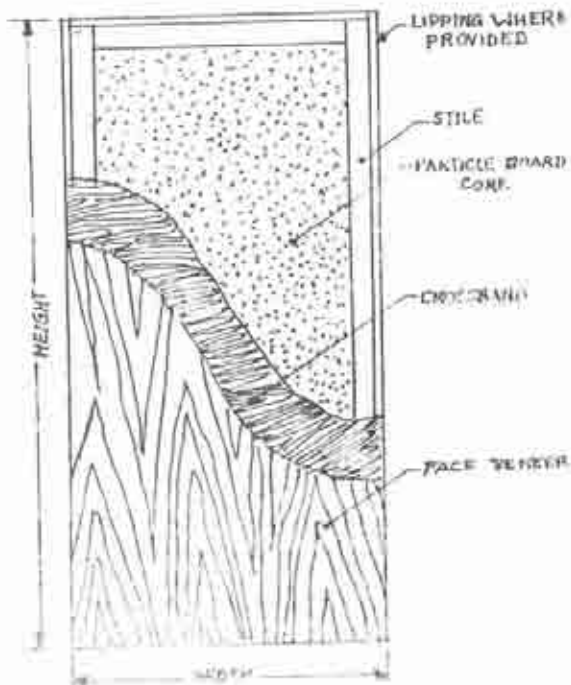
TYPICAL PARTICLE BOARD CORE FLUSH DOOR SHUTTER
